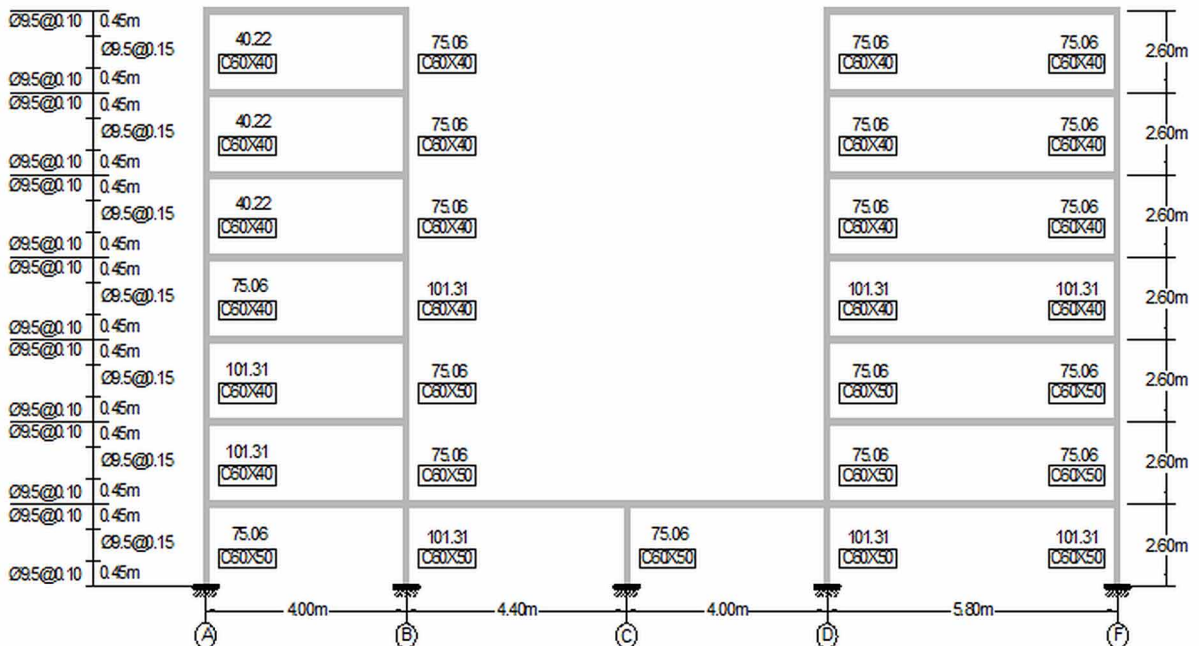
Residential building, geometry and reinforcement in beams of the frame 8
